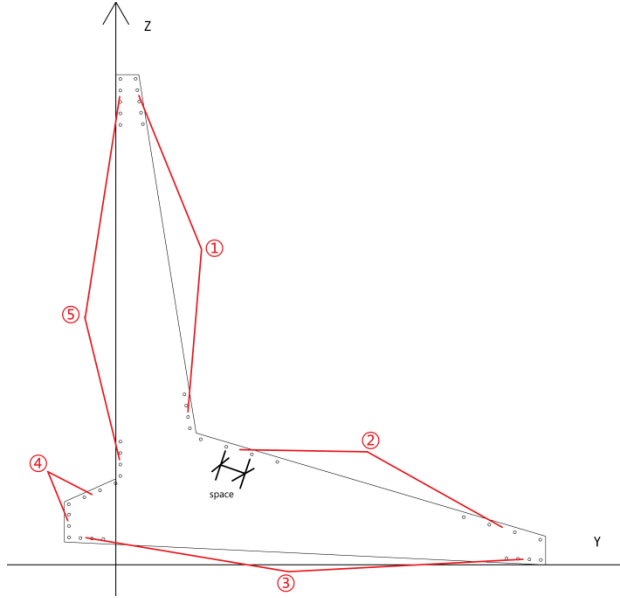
Detailed drawing of longitudinal reinforcement coordinates
